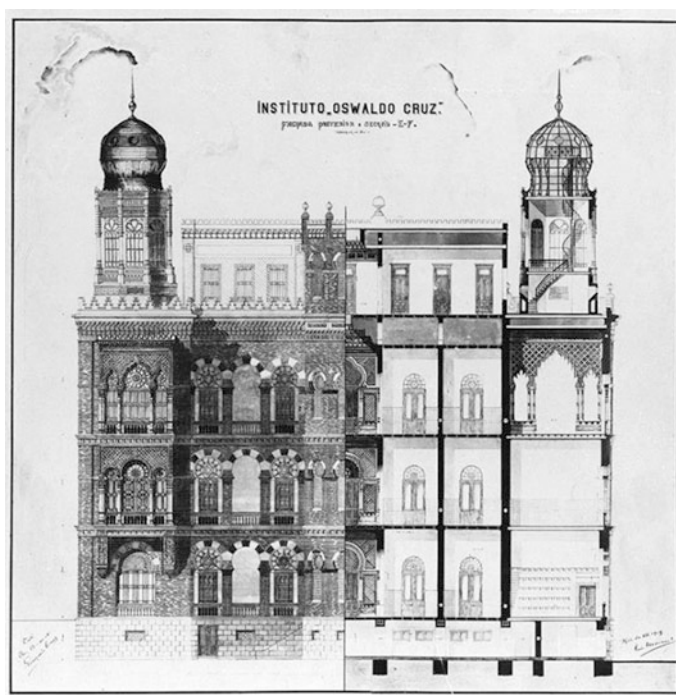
Final design for the Pavilhão Mourisco—Elevation and cross section, by Luiz Moraes Jr., made while the pavilion was already being built (1908)
